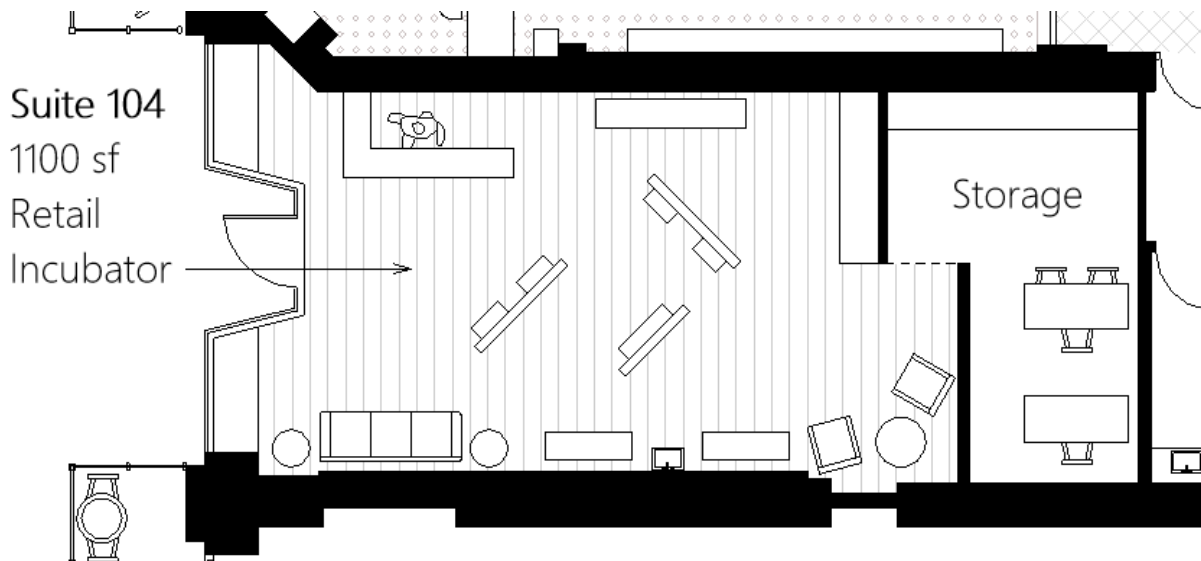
Floor plan of Interurban Building Suite 104. Refer to Appendix F for full plan.
